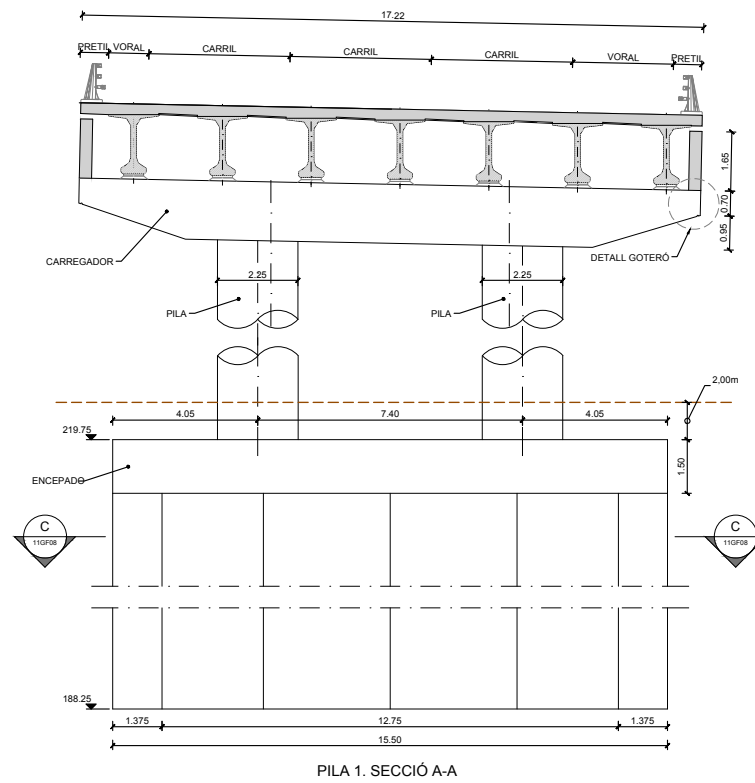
Foundation, piles and header cross-section (dimensions in meters).
